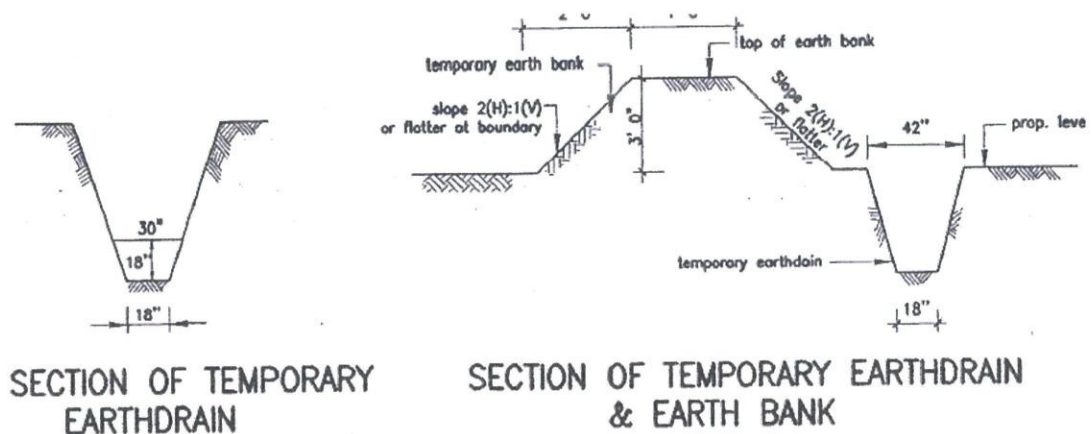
11 Cross Section of Temporary Earth Drain and Earth Bank that shown in construction drawing
